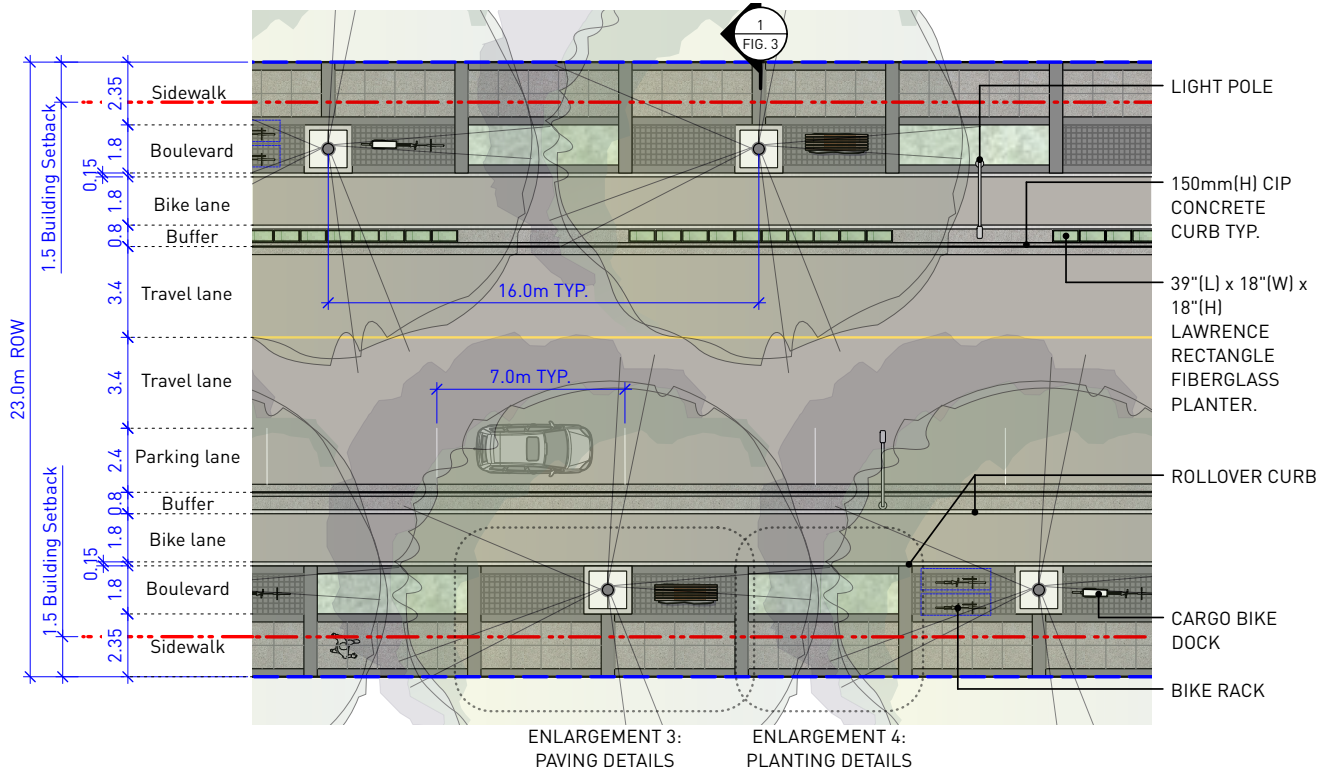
ENLARGEMENT 1 - TYPICAL STREETSCAPE
